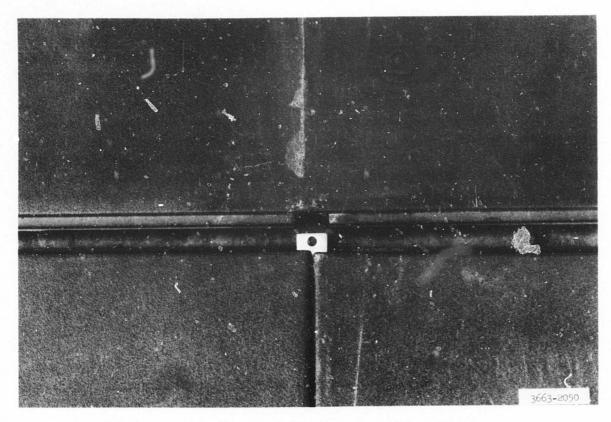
View showing how the 1-in. web extension of the locking bar fits into the notched male side connector
